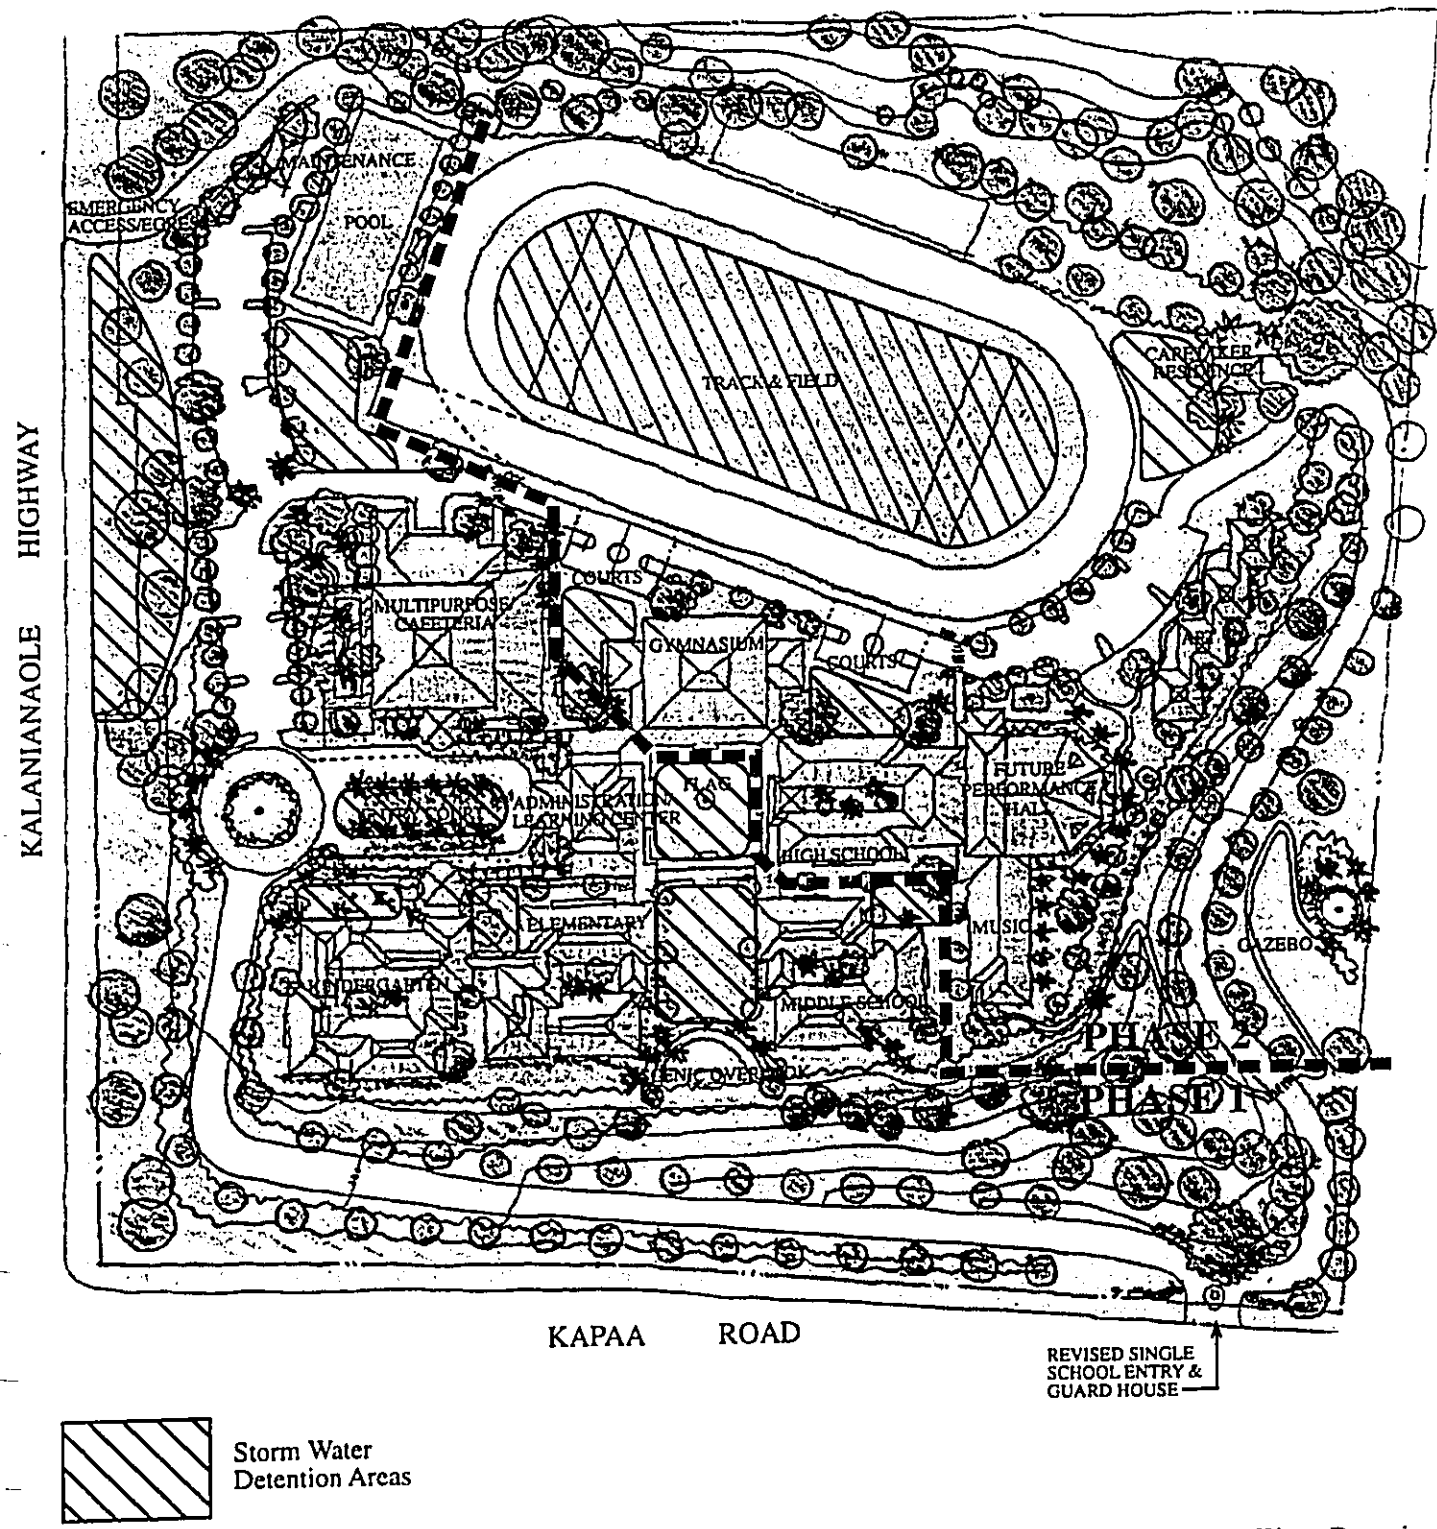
Conceptual Site Plan - Storm Water Detention Areas
